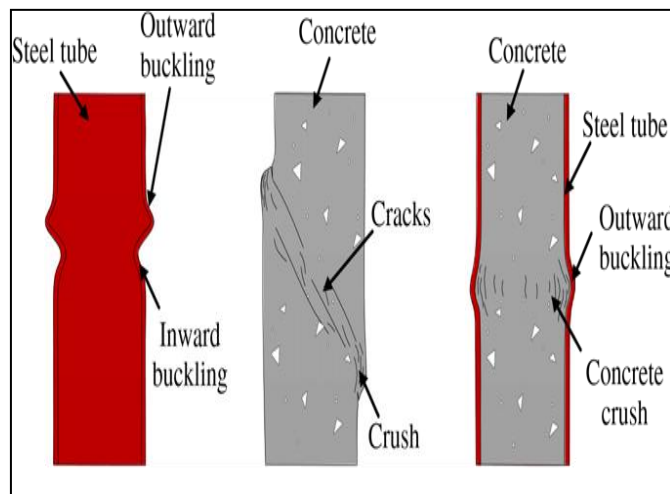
Schematic Failure Modes for Steel Tube, Concrete and the Stub CFST Columns (Han et al. 2014)
